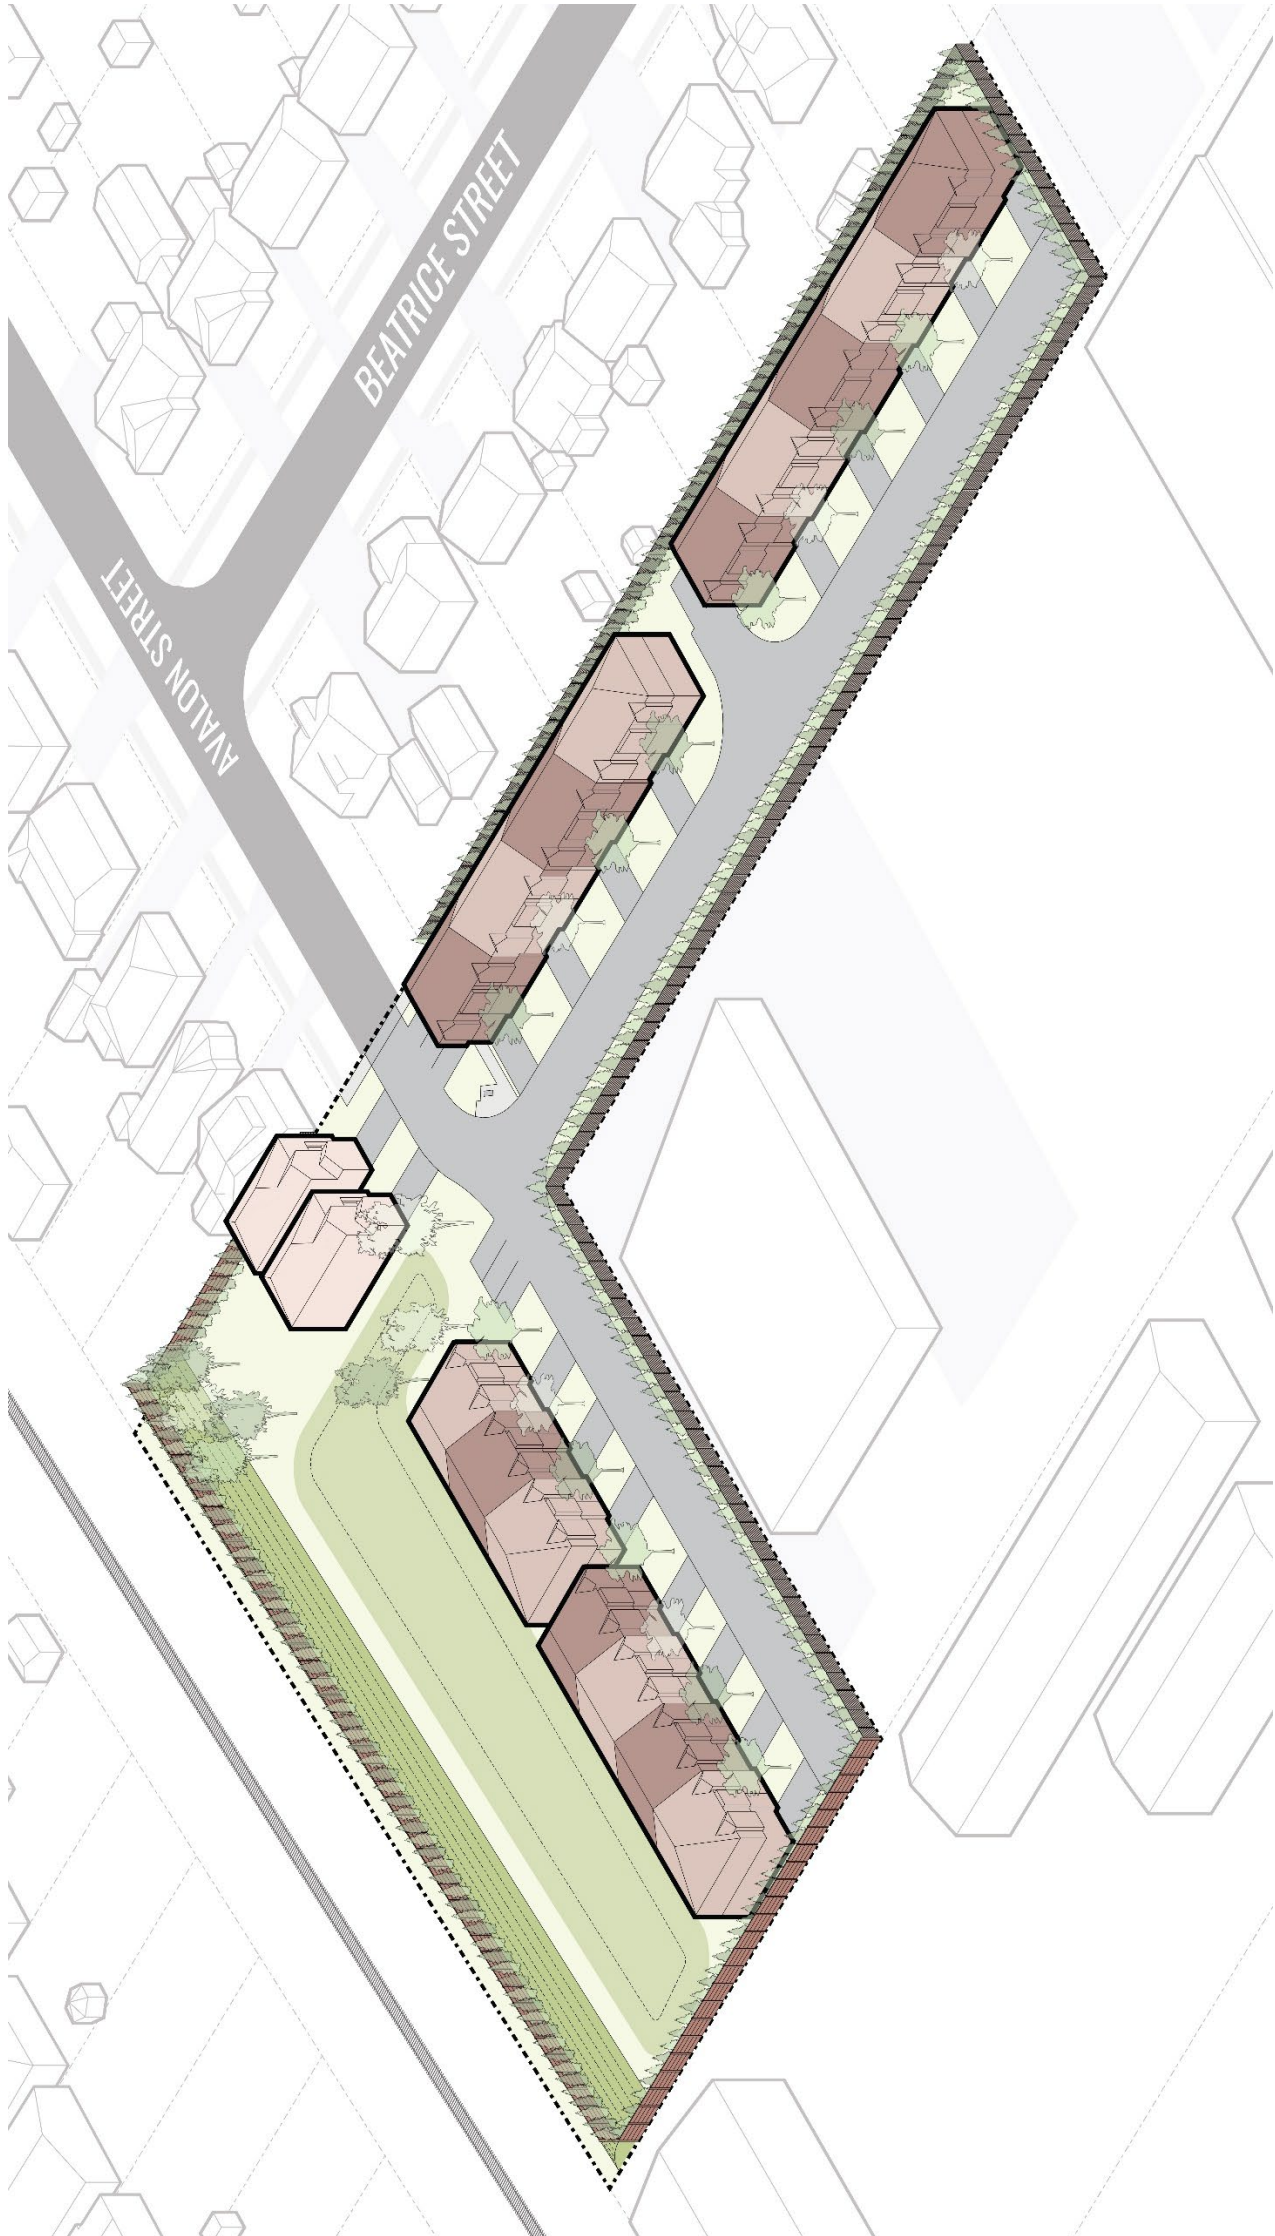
Isometric concept plan of existing single detached dwellings and 2-storey townhouse buildings proposed to be located at 1806 Avalon Street.
